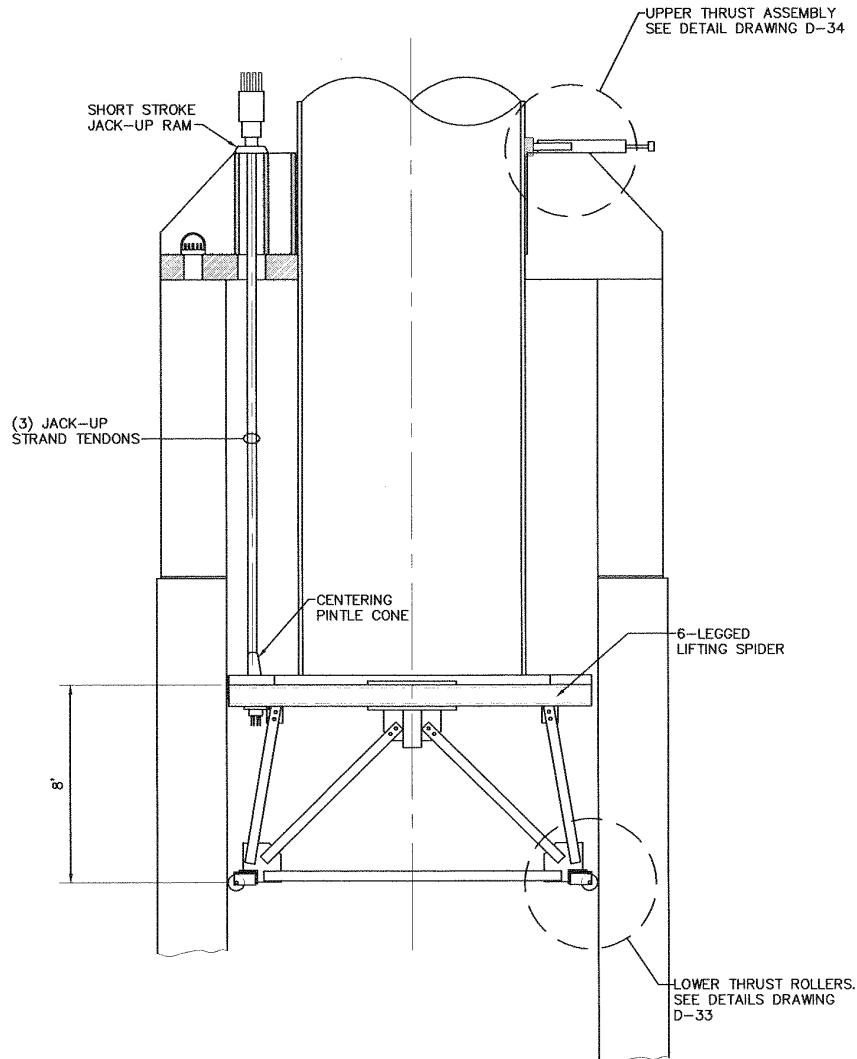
Hybrid steel/concrete tower jacking arrangement
